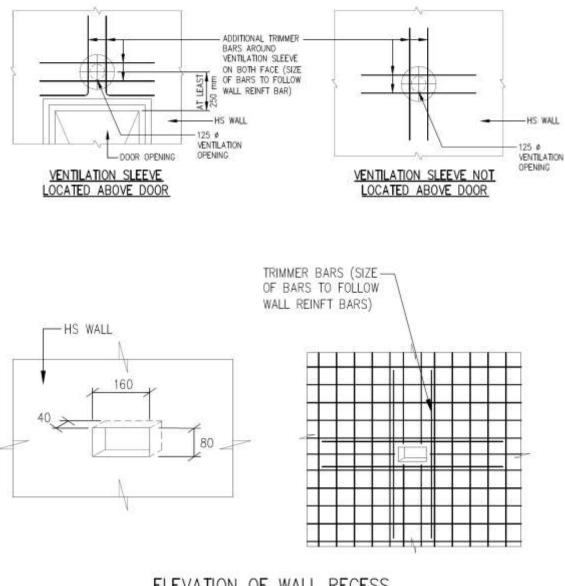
STEEL REINFORCEMENT BAR DETAILS FOR SWITCHED OUTLET, TC, RADIO AND POWER POINT
